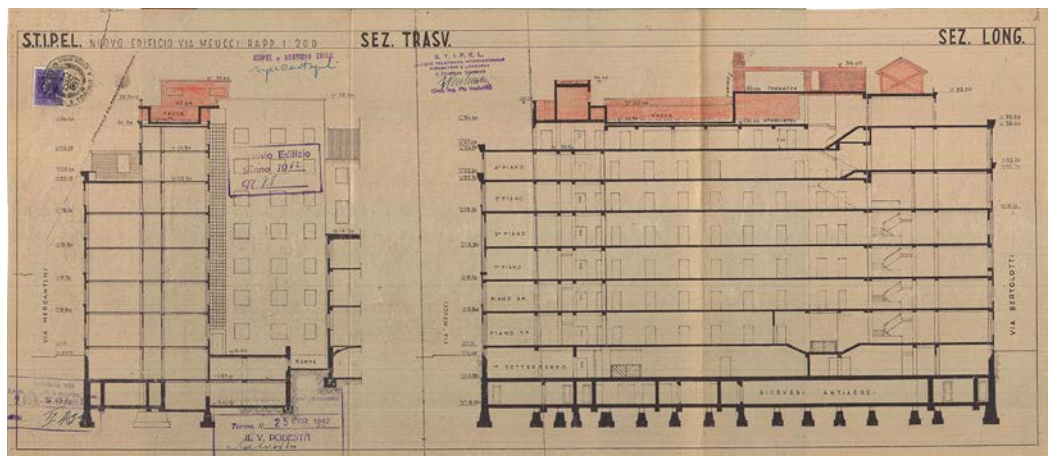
Cross and longitudinal sections of the building, signed by the architect Castagnoli, 1942 (EdificaTO Archive).
